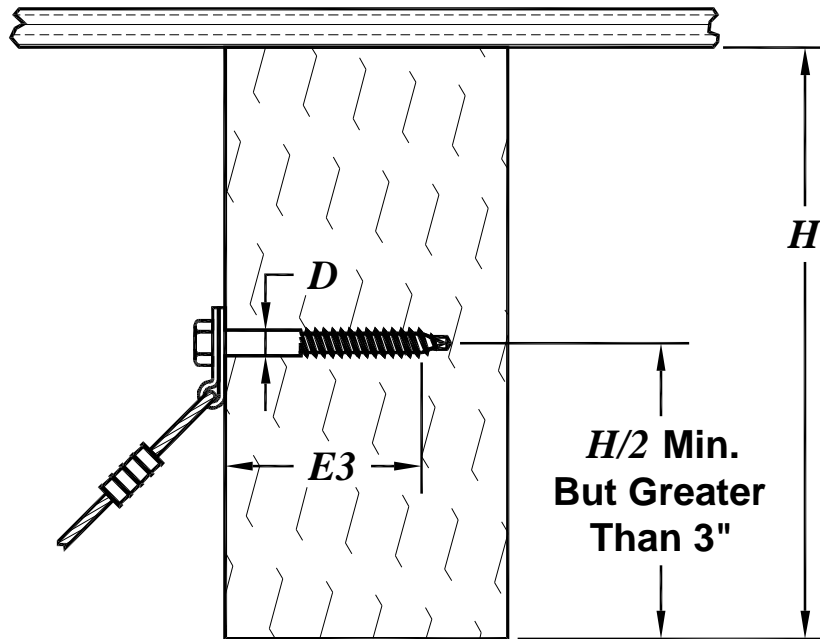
; KSUA Attached to a Wooden Joist or Beam in Orientation 2 Using a Lag Screw
